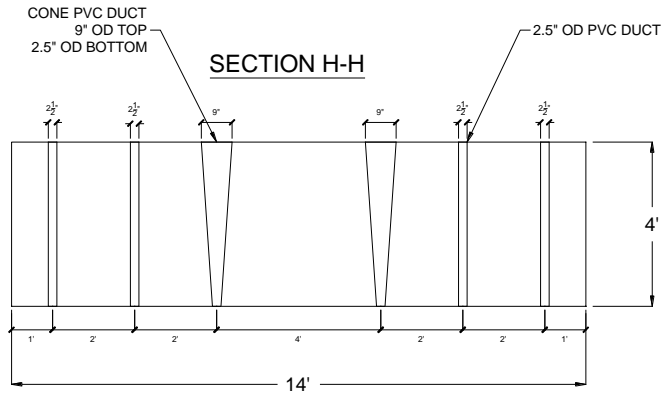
Footing elevation showing PVC ducts (Lotfizadeh, 2019).
